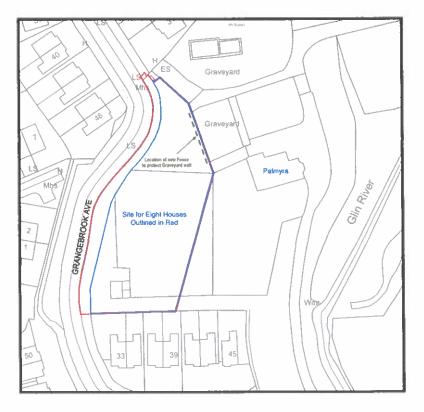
Map, showing site outlined in red. Location of proposed fence to protect Graveyard wall is shown by the dashed green line.
